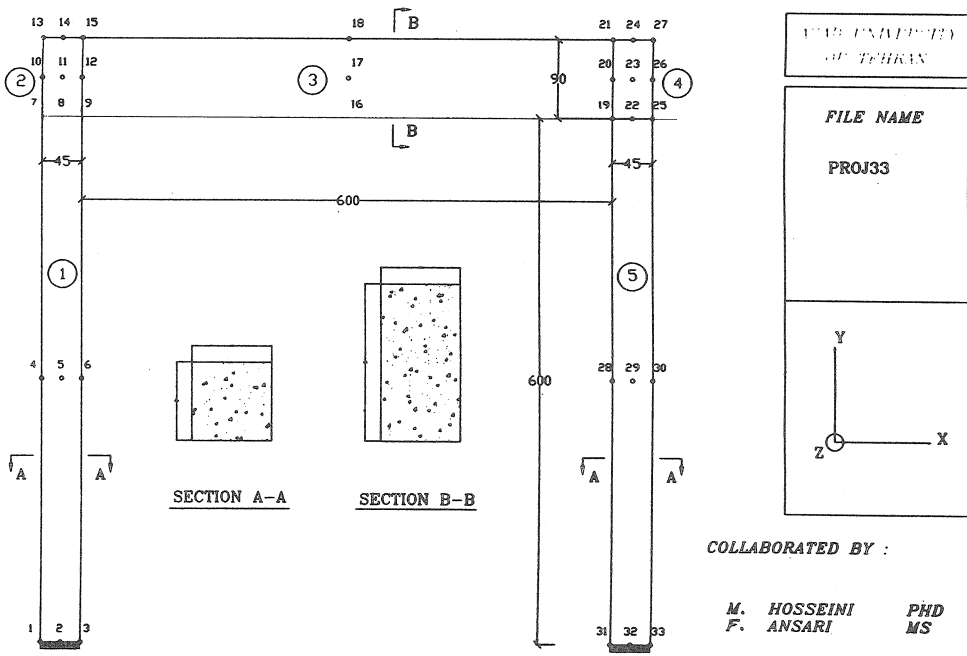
Bent structure of an existing highway bridge modelled by five 9-node elements
